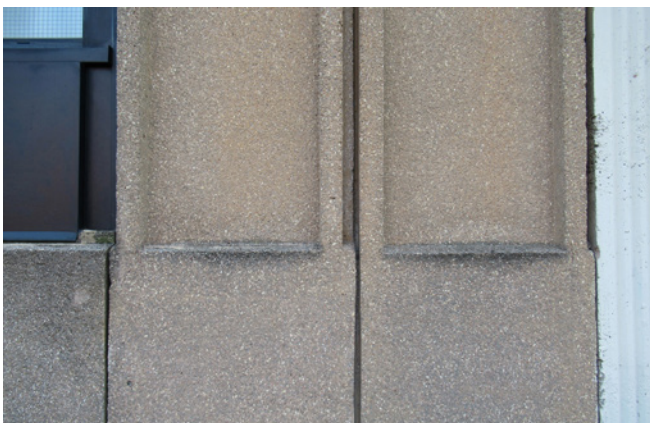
The building complex in via Palmanova, Milan, 1962–67. Detail of the façade. (Photo of the author).
